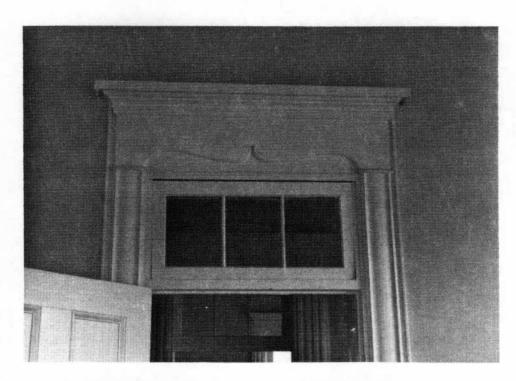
Curvilinear door details of Fairfax' first floor rooms.
